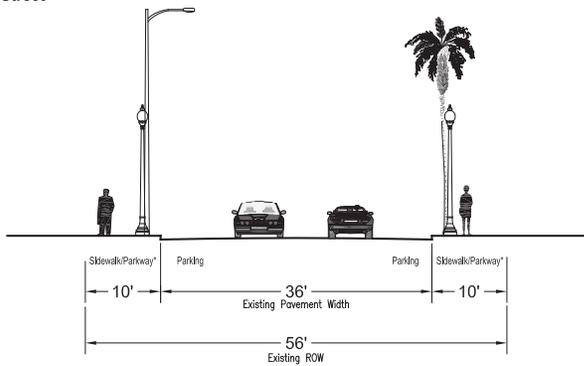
TYPICAL SECTION - 3RD AVENUE
